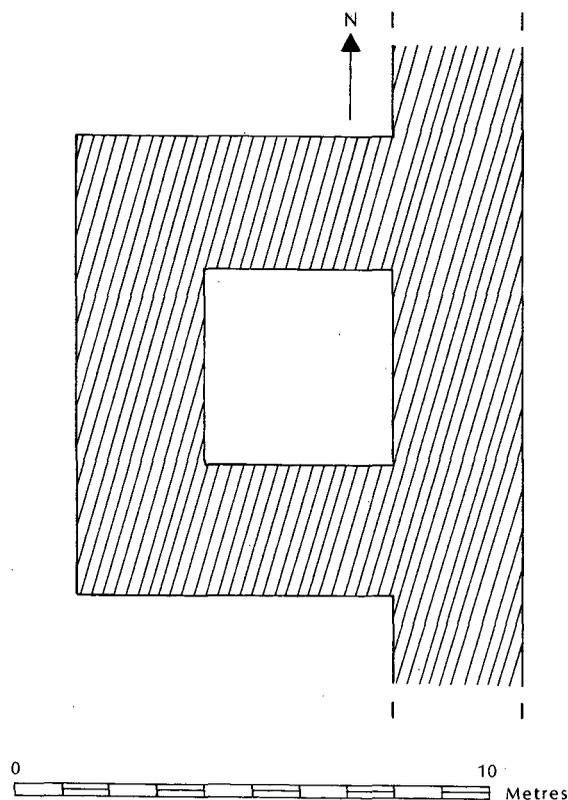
Area P. Reconstruction plan of the tower and adjacent curtain-wall.
